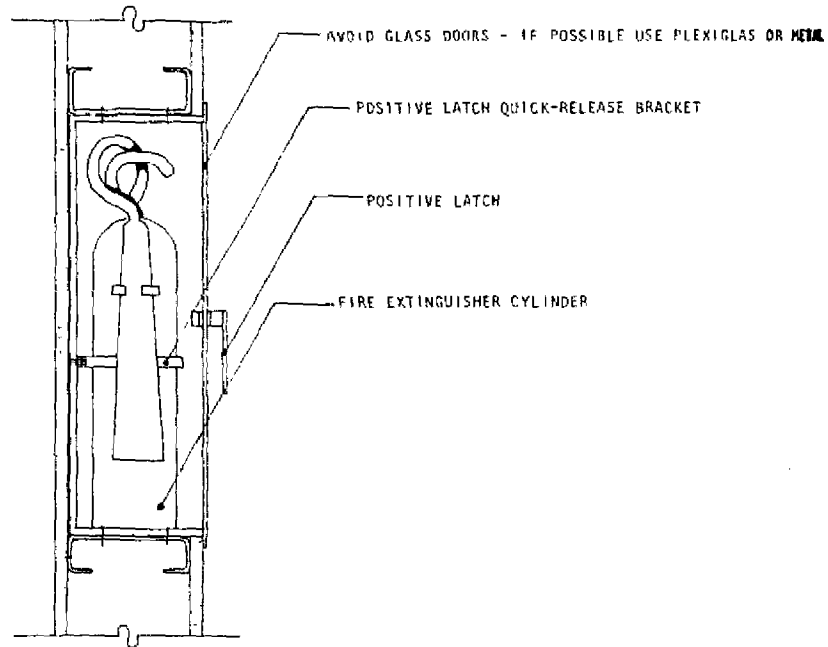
Fire protection systems. Fire extinguisher installed in a wall cabinet.
